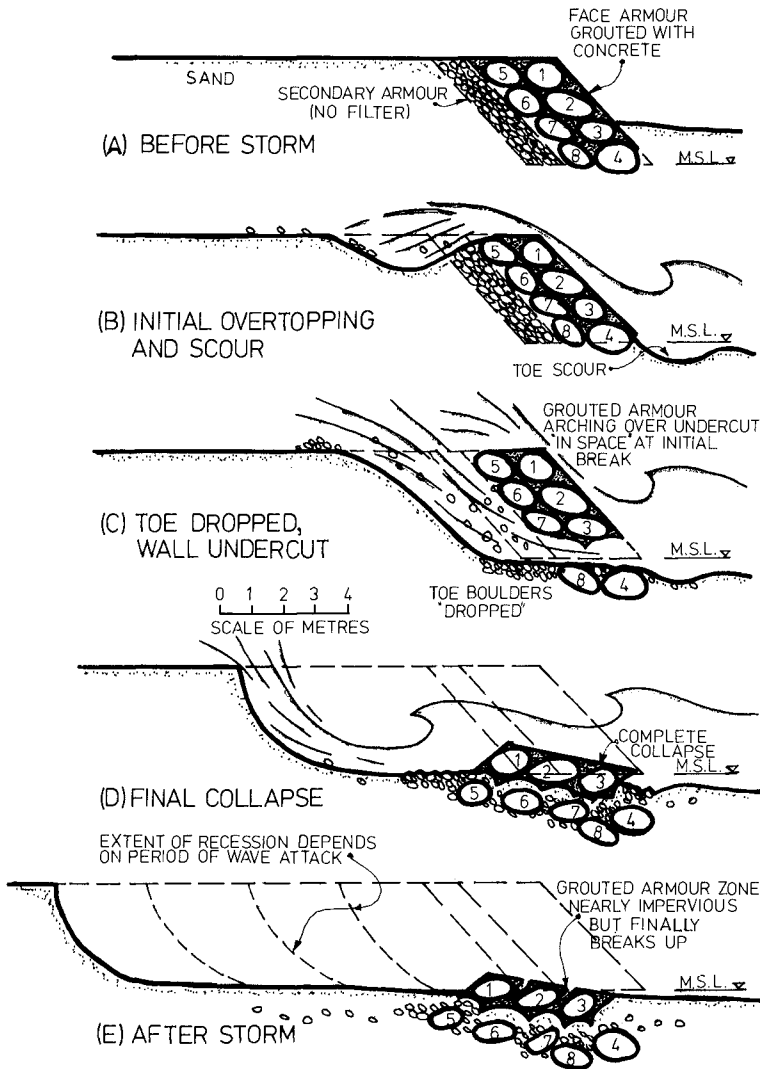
COLLAPSE MODE OF GROUTED WALL
